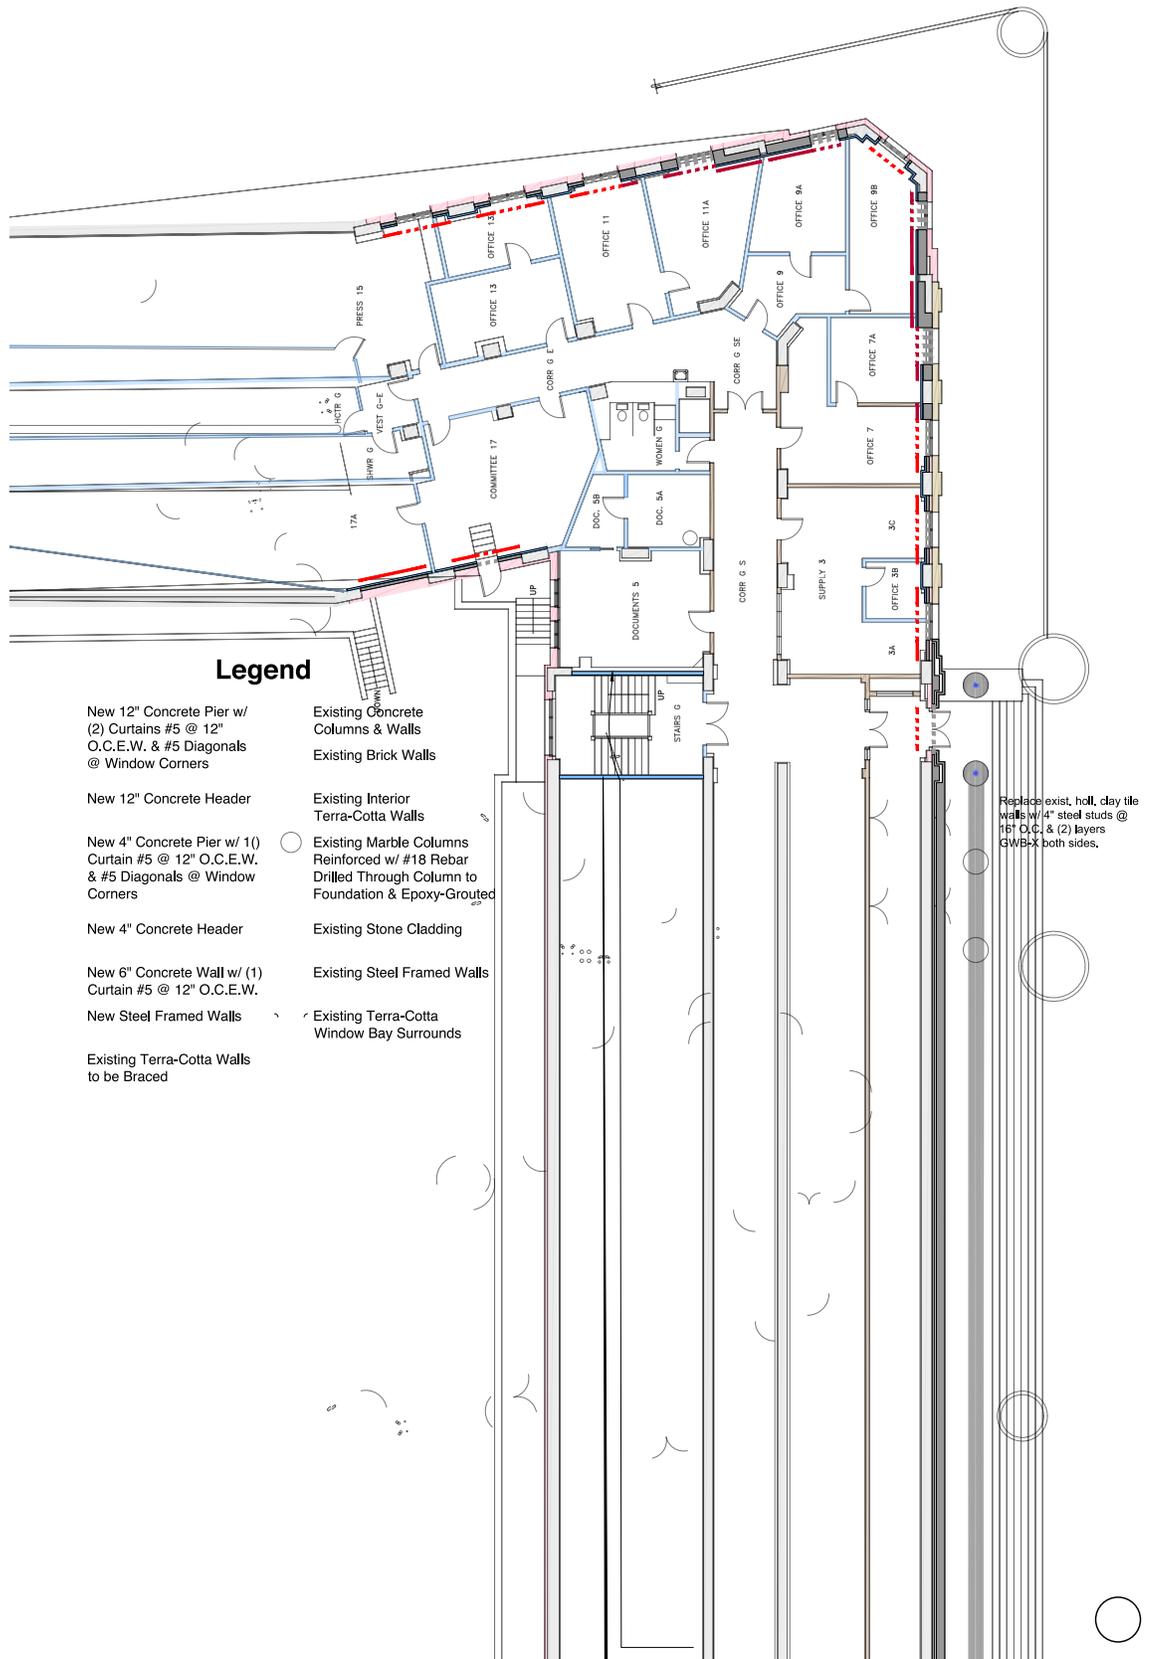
(2): Recom. HCT Wall Bracing/Replacement Locations-Floor Level 0
